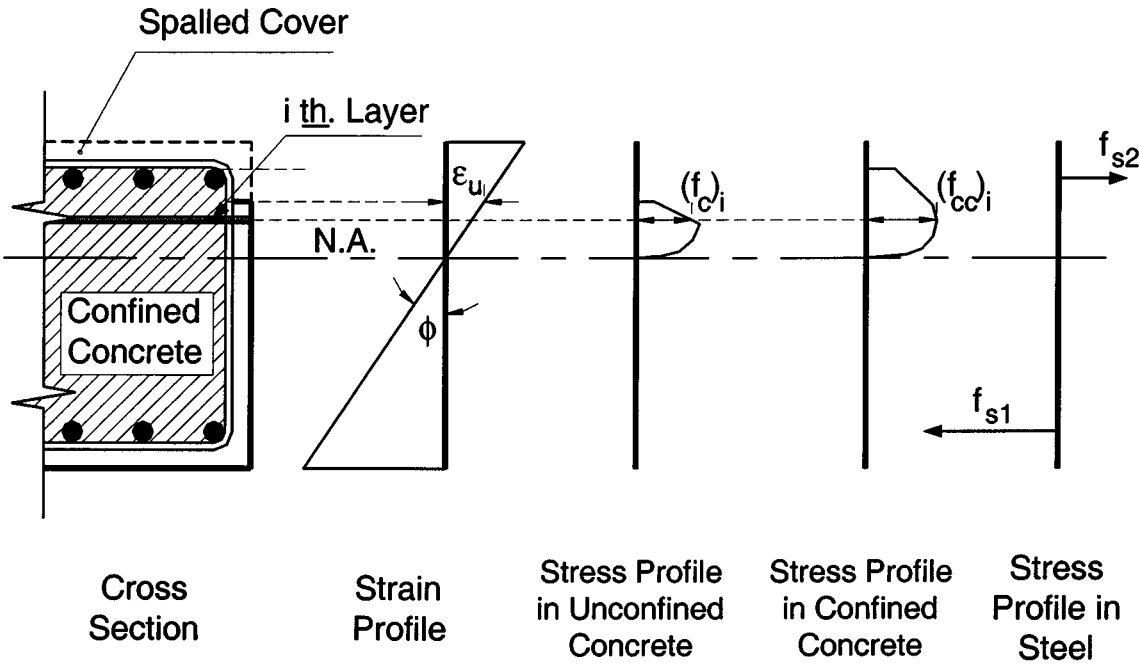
Pier Wall Cross Section Subjected to Axial Load and Bending
